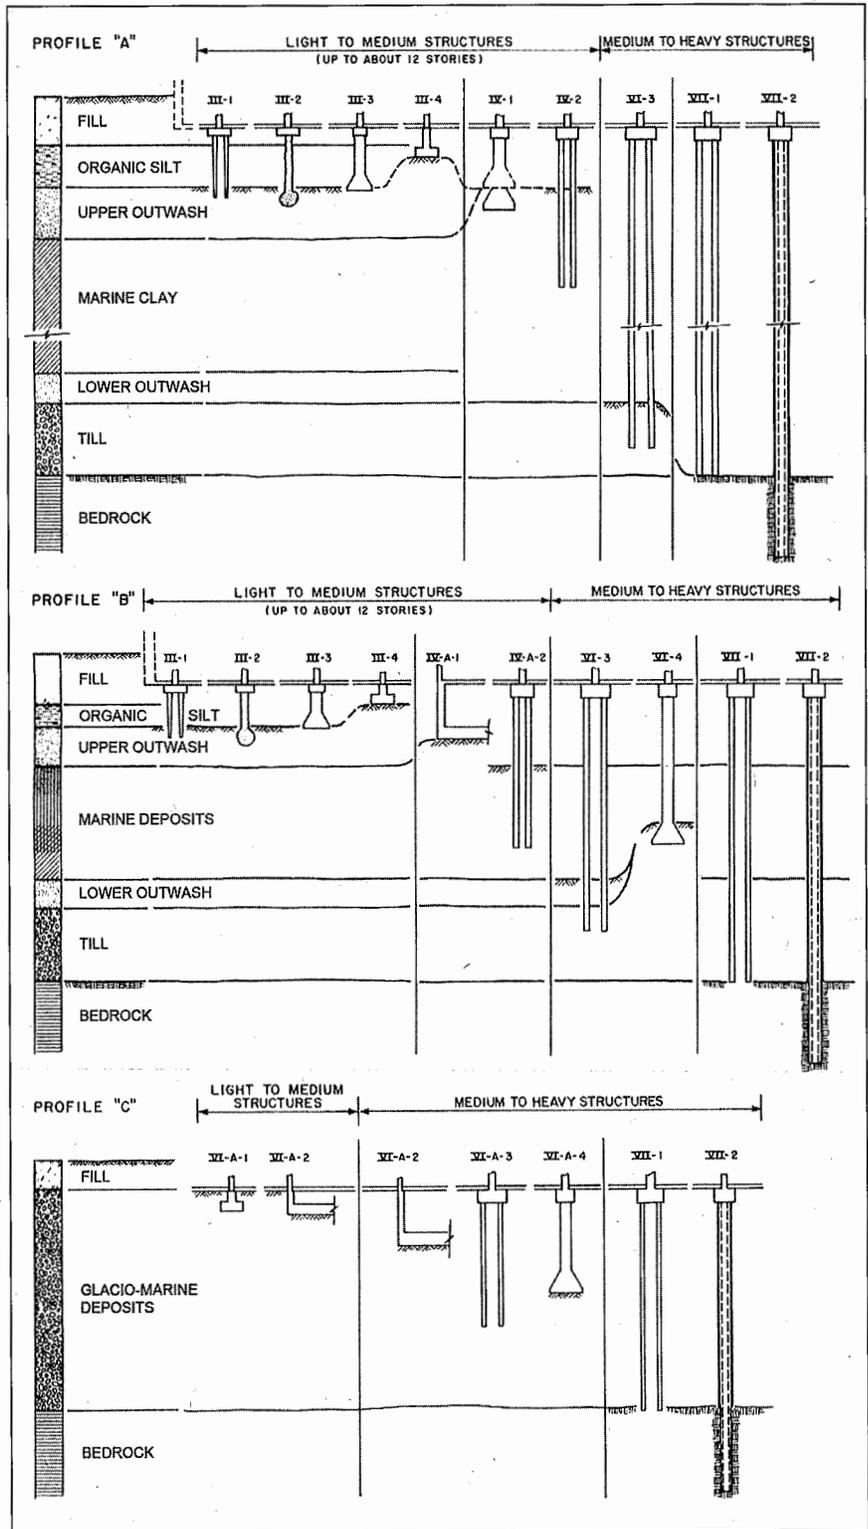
Typical foundation types used in Boston. (See Figure 4-2 for details on geologic columns.)
